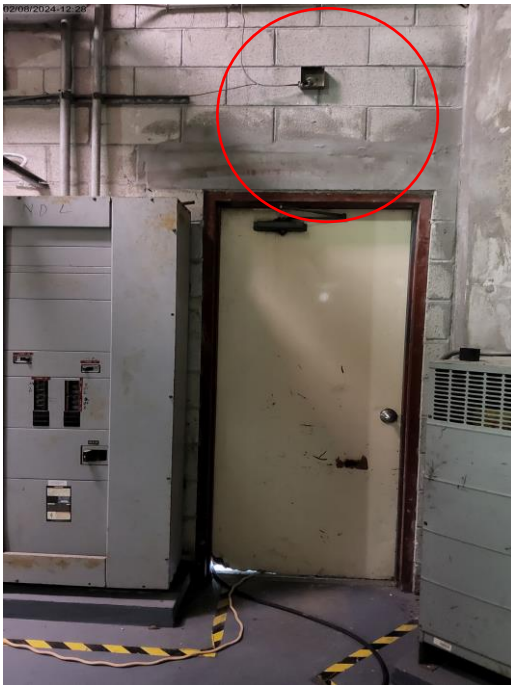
Item 22.a. Main Electrical Room. Missing exit sign.
